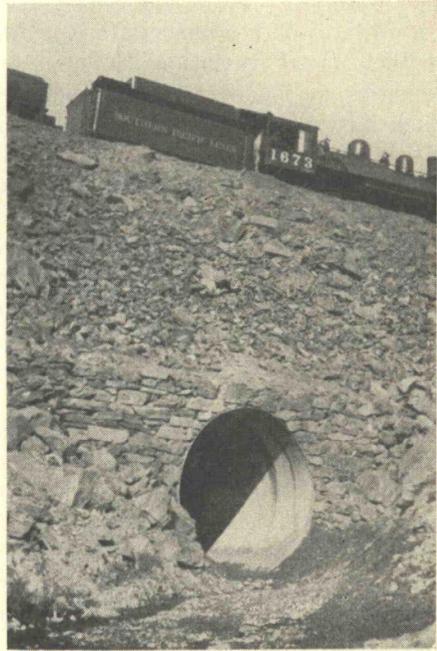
A 96-in. 8-gage culvert 100 ft. long
